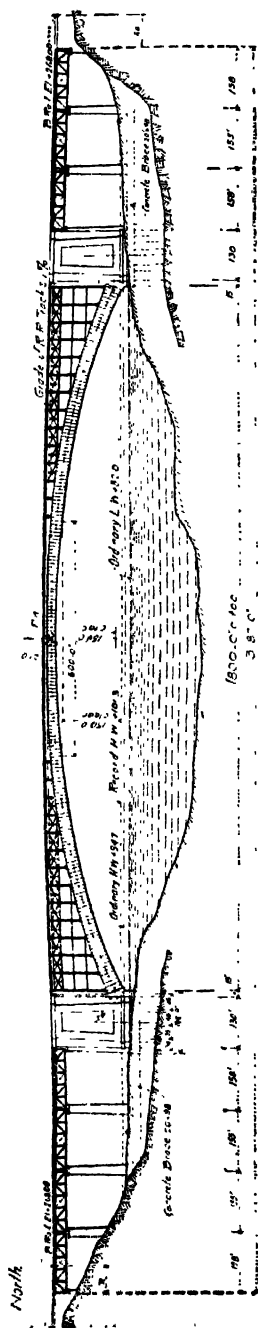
d*. Proposed Arch Bridge over the St. Lawrence River at Quebec.
